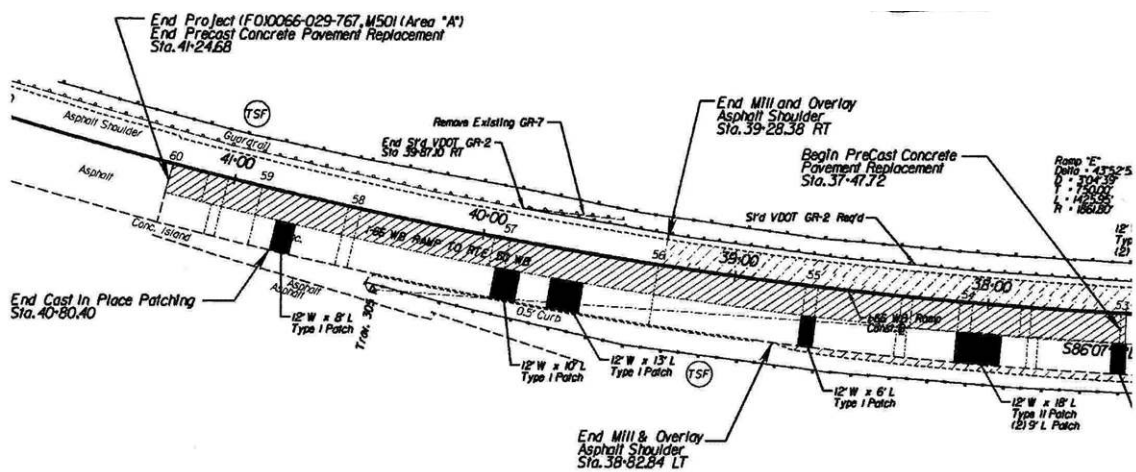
Typical reconstruction layout for the connector ramp utilizing JPPS (cross-hatched) and high early strength concrete (solid black).
